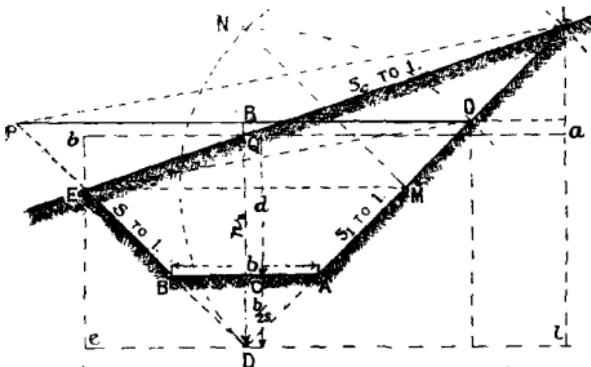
Equalising a Cross-Section on a Cross-Slope into a Cross-Section on a Level Surface.
